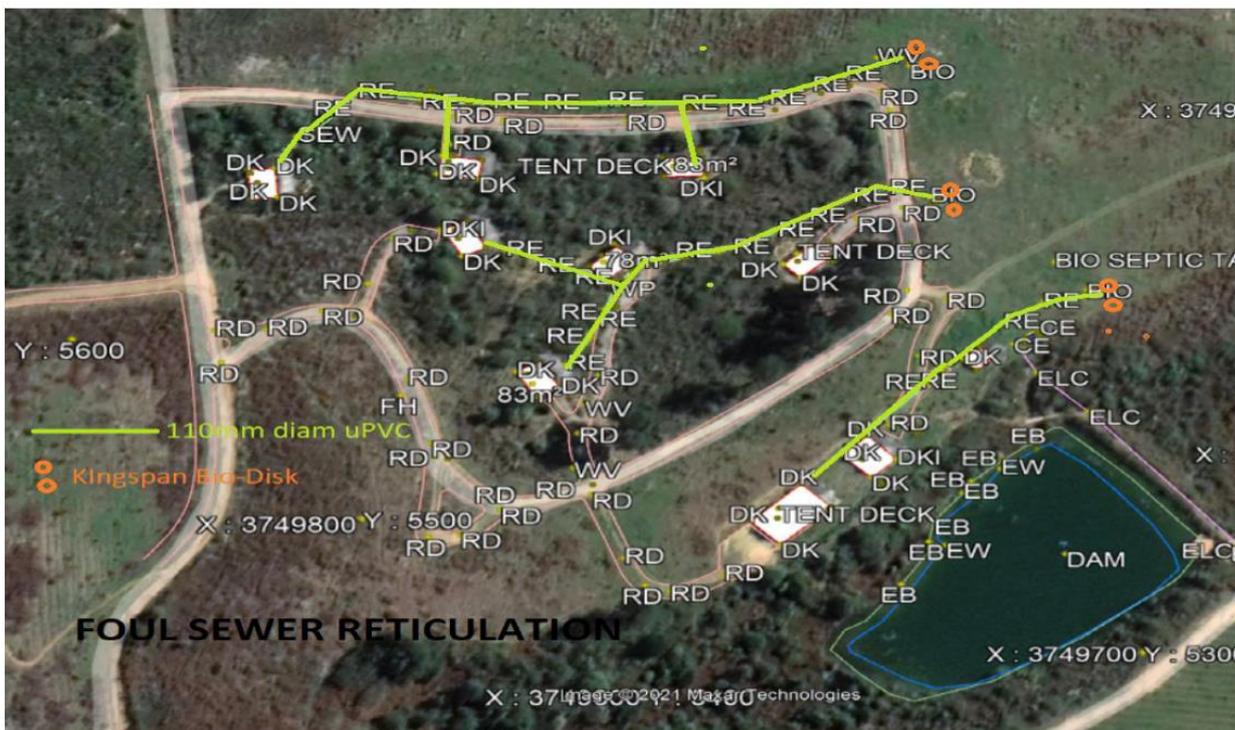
Sewer reticulation system at the Tented Camp site.
